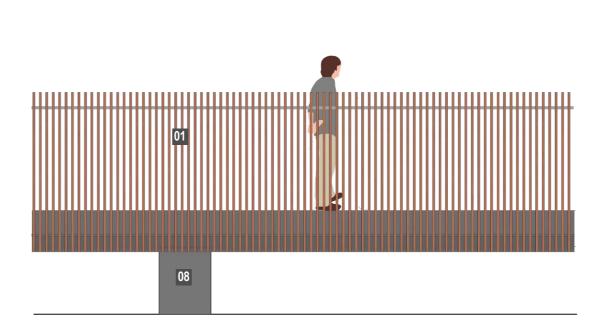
Typical cross section and elevation of boardwalks - 1:20
